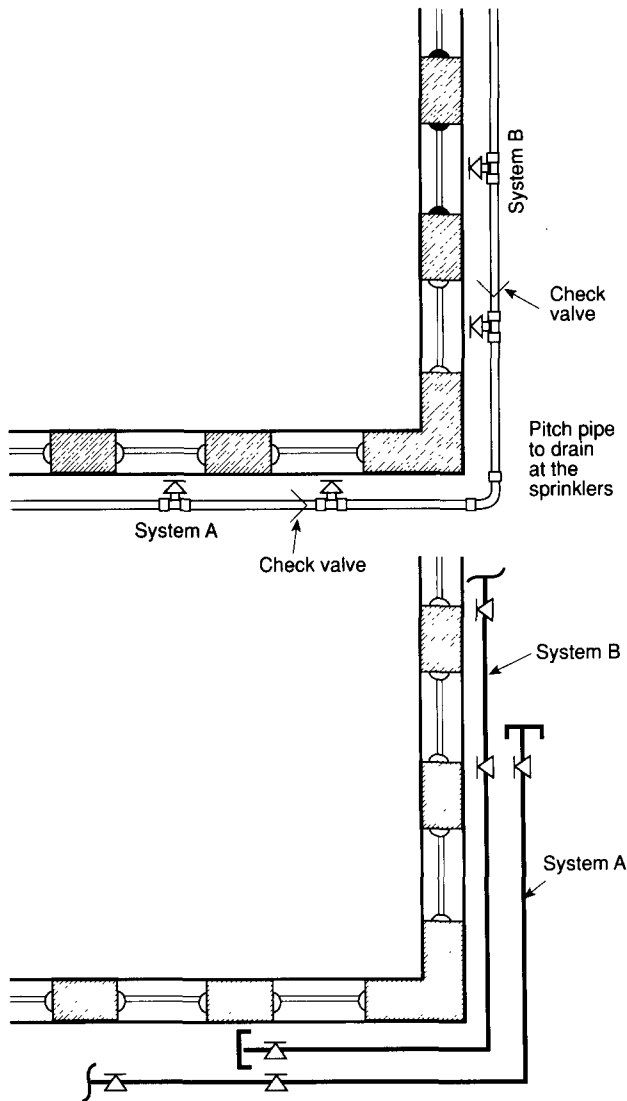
Arrangement of check valves. Top: typical. Bottom: alternate.
